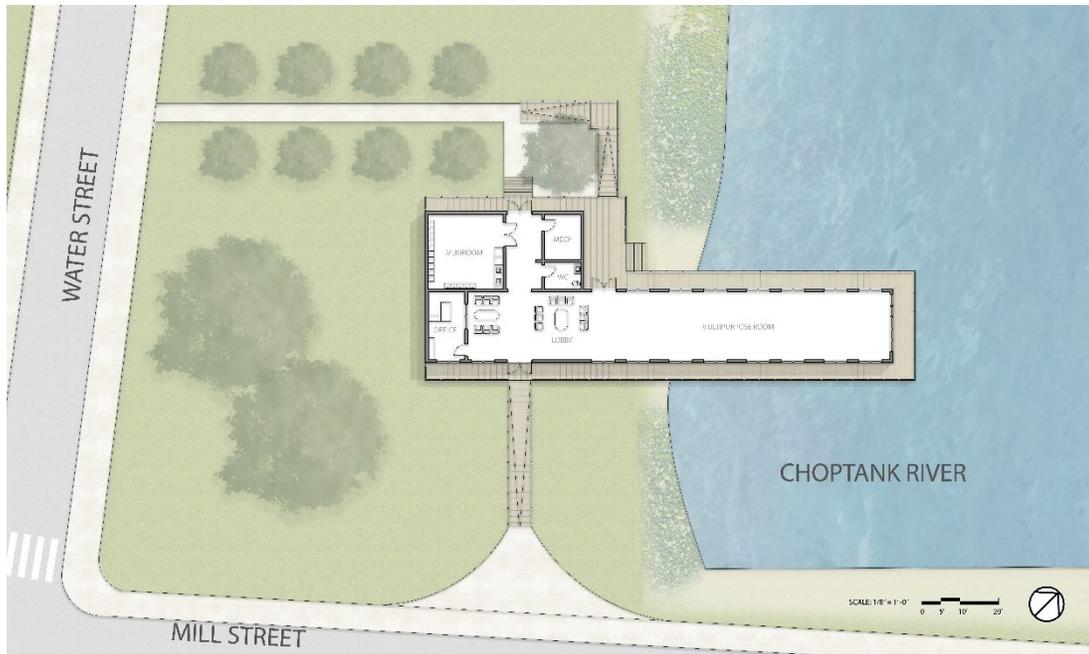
Floor plan of Waterfront Pavilion. Source: Author
